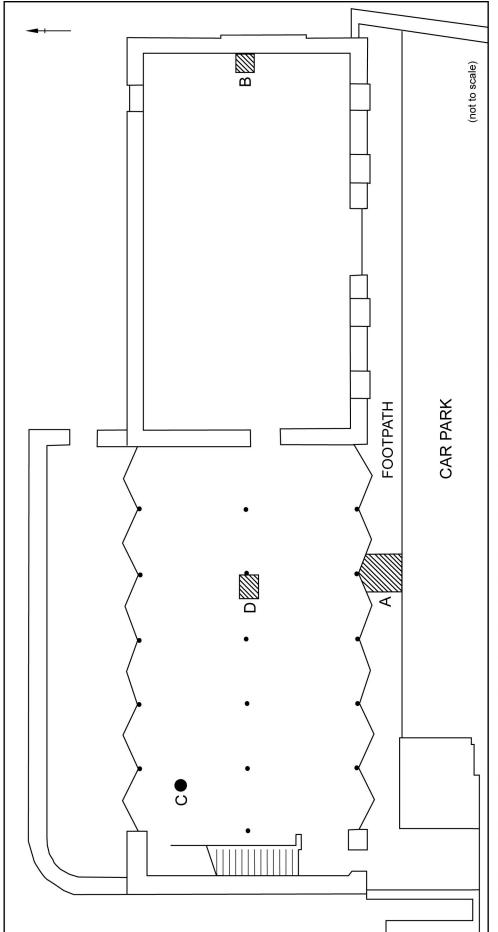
Barrack Coach House, ground floor plan, showing locations of excavation trenches and borehole.
